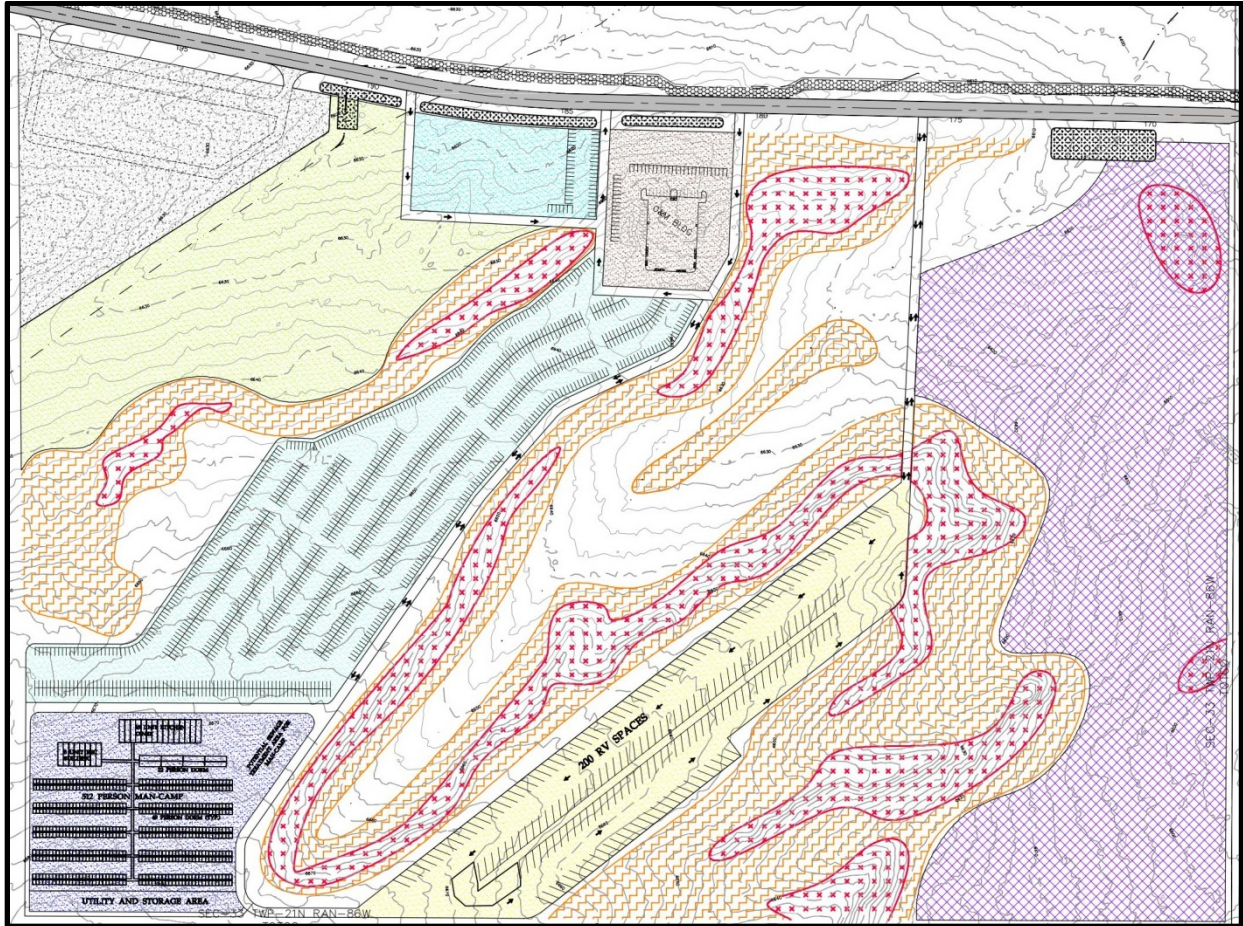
On-Site Accommodations Arrangement in North Laydown Yard
